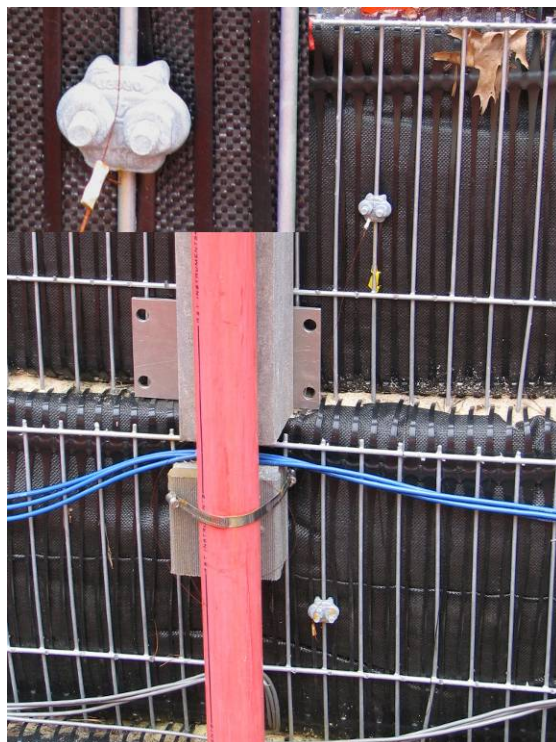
Photo. Potentiometer wire connection to welded wire facing.
